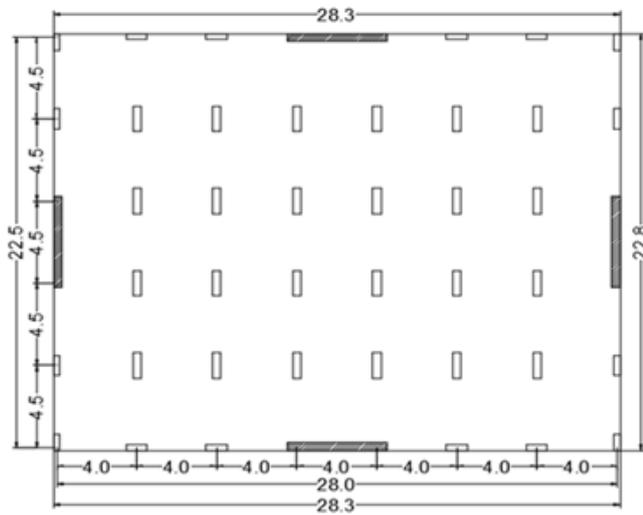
Model (3) Building with Shear Walls at the center of exterior perimeter
